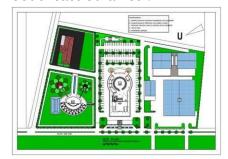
Site Plan of Modern Regional Library of Southeast Sulawesi building construction (Author Documentation, 2021)
